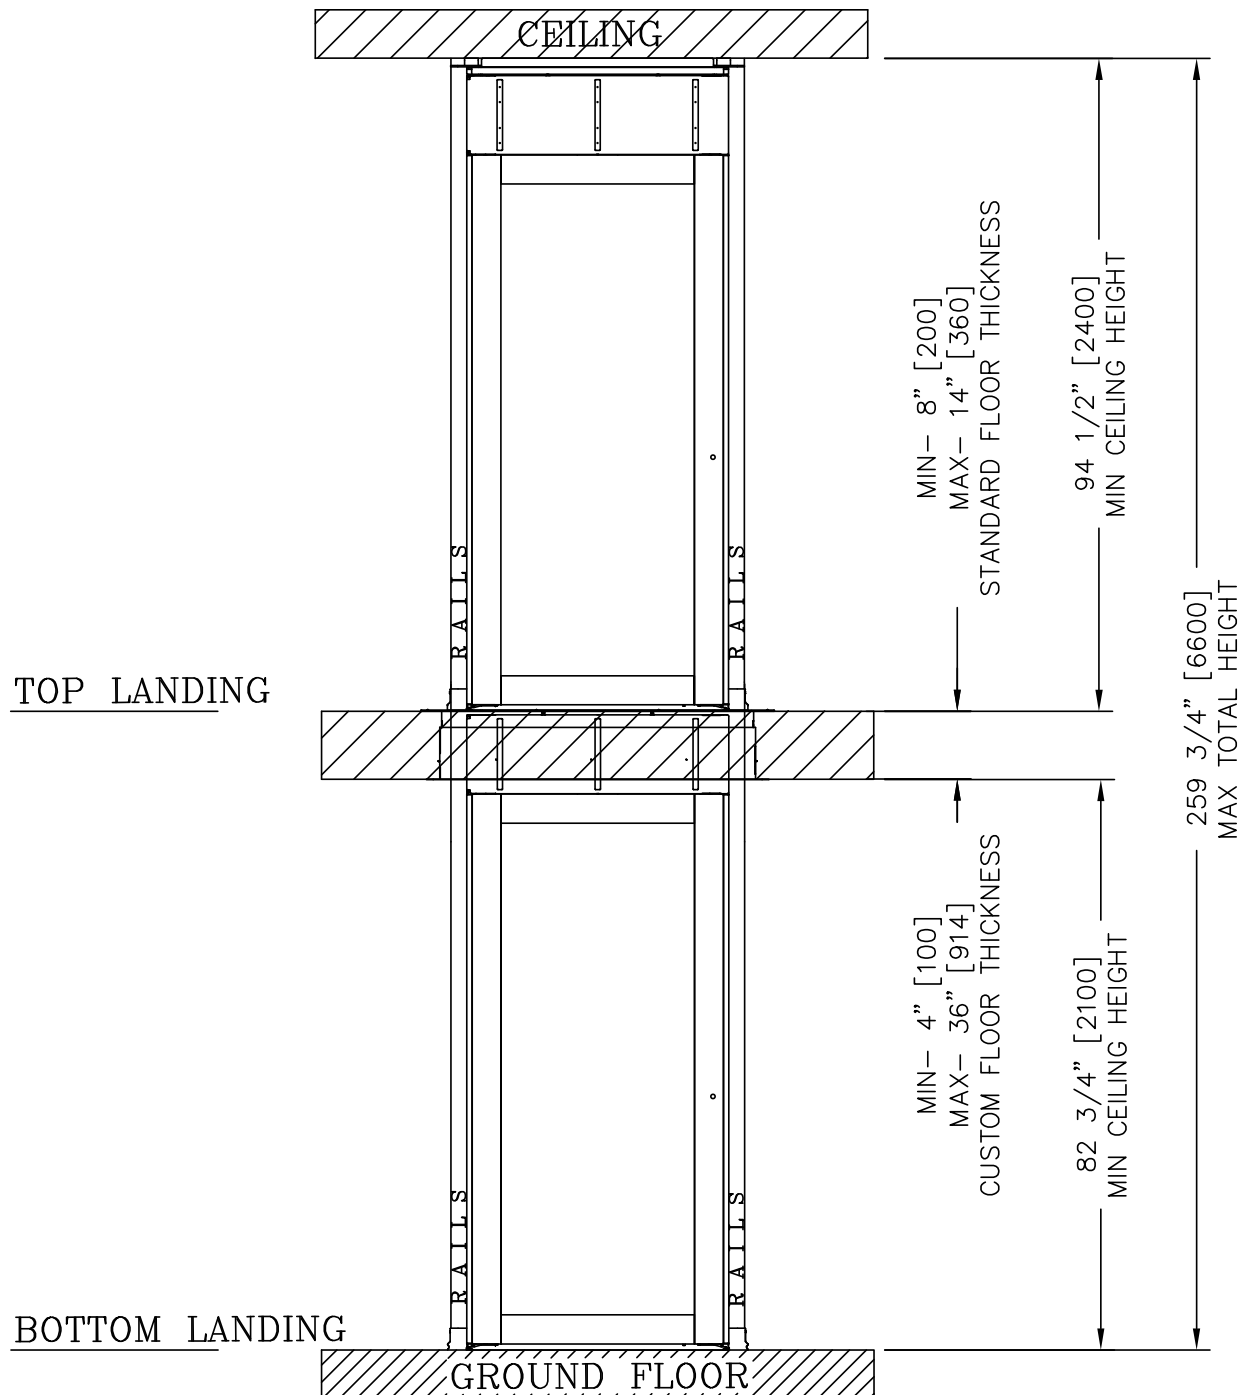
Elevation View - 2000 mm (78 3/4") Cab
